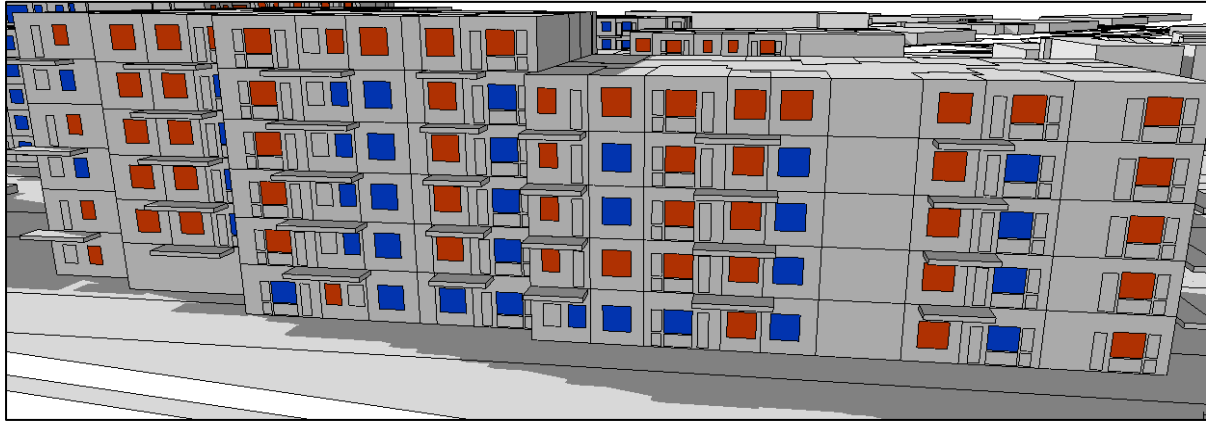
Windows achieving 1.5 hours of sunlight - Northeast elevation of Building 08 (modelling software)
